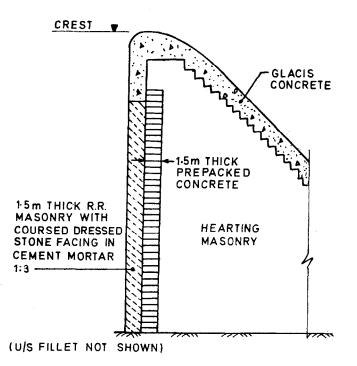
PREPACKED SANDWICH CONCRETE MEMBRANE ON UPSTREAM FACE
